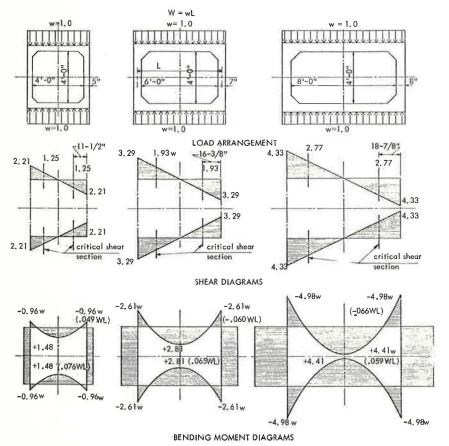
Load, shear, and bending moment for culvert subjected to uniform lateral earth load.
